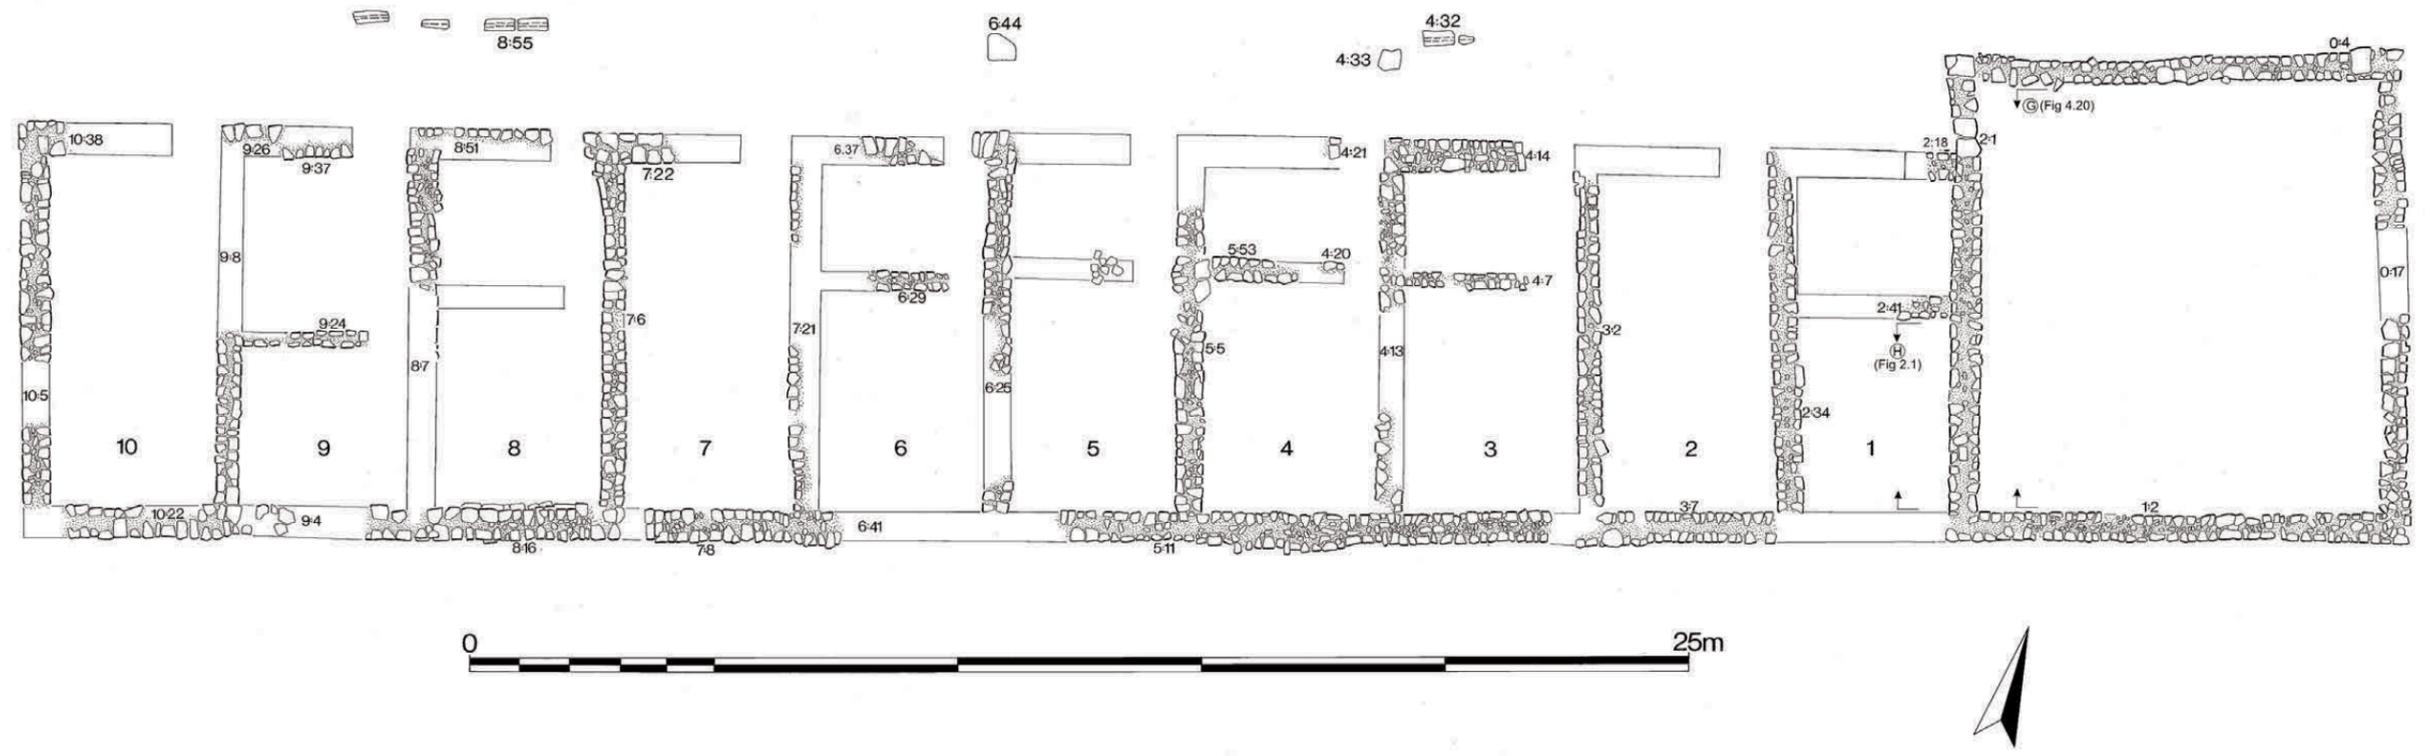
Plan of Building XIII – conventional barrack phase (scale: 1:150).
